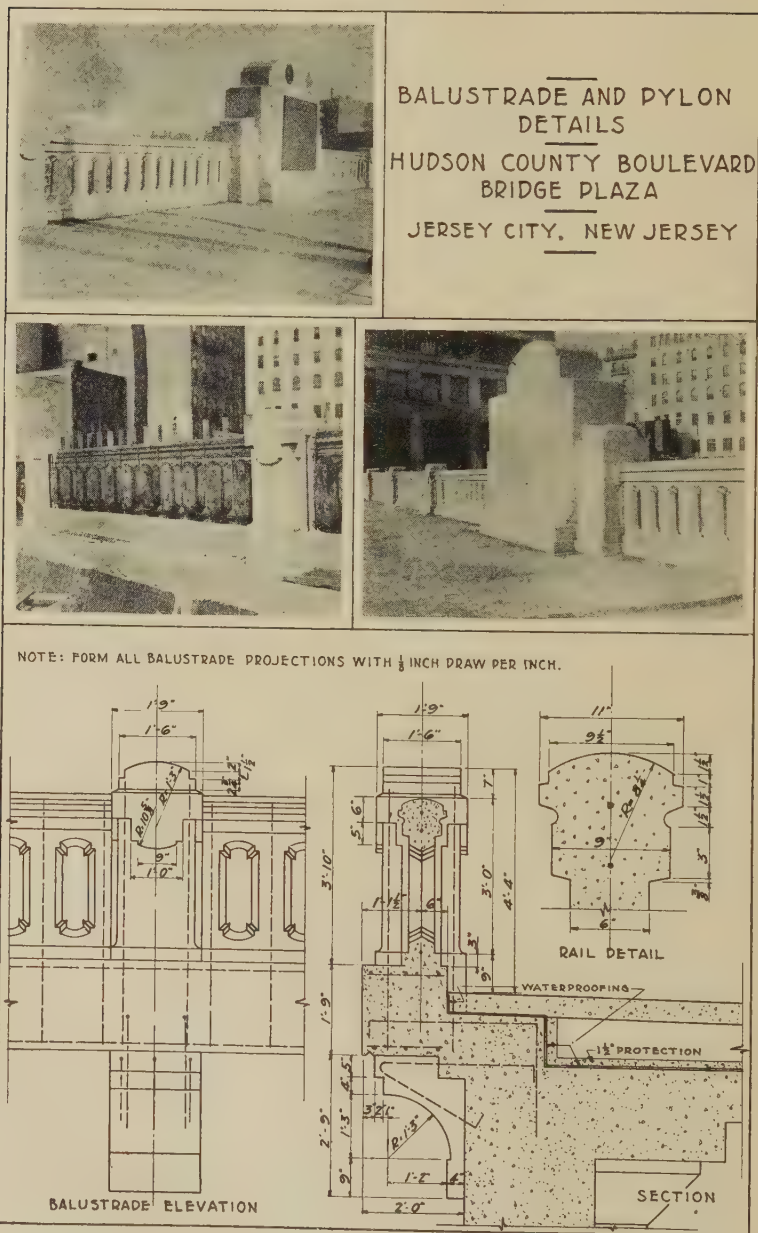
HUDSON COUNTY BOULEVARD BRIDGE BALUSTRADE.
